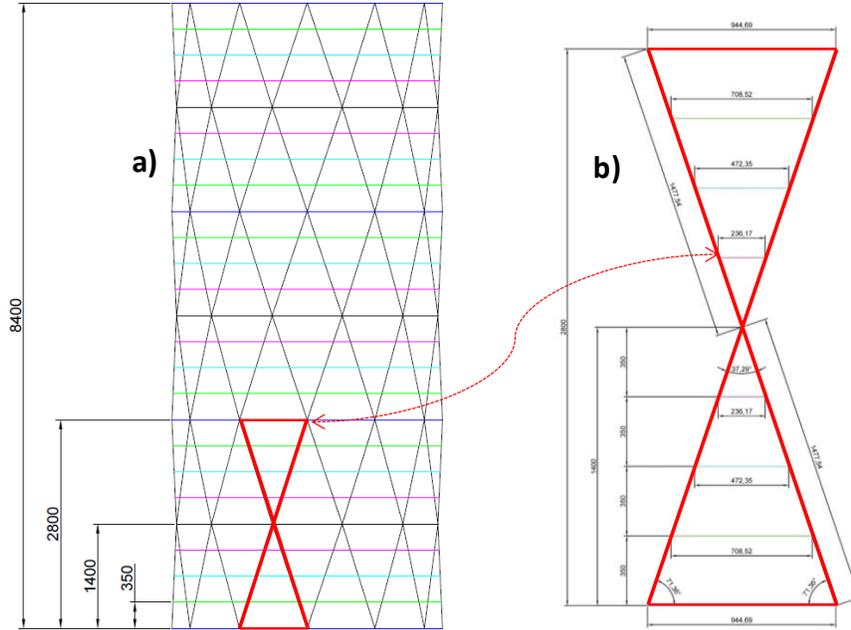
Elevation views of 24-story building: a) Diagrid; b) Triangular module
